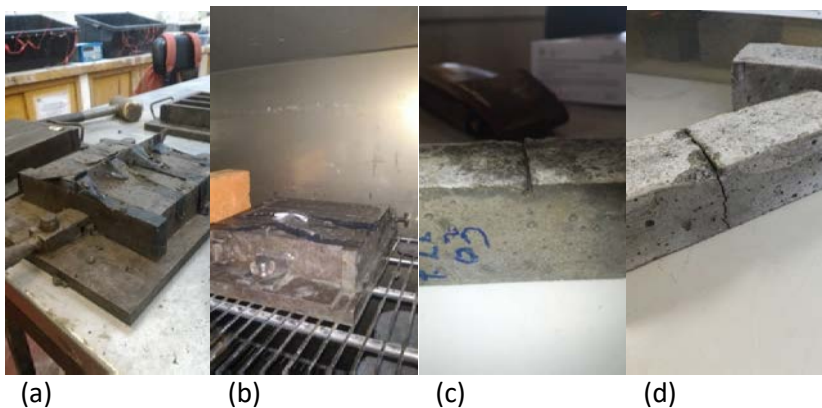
From left to right: (a) Cut sheet to form crack in the specimen; (b) Specimens in the oven; (c) Specimens after demolding; (d) Specimens after test.
